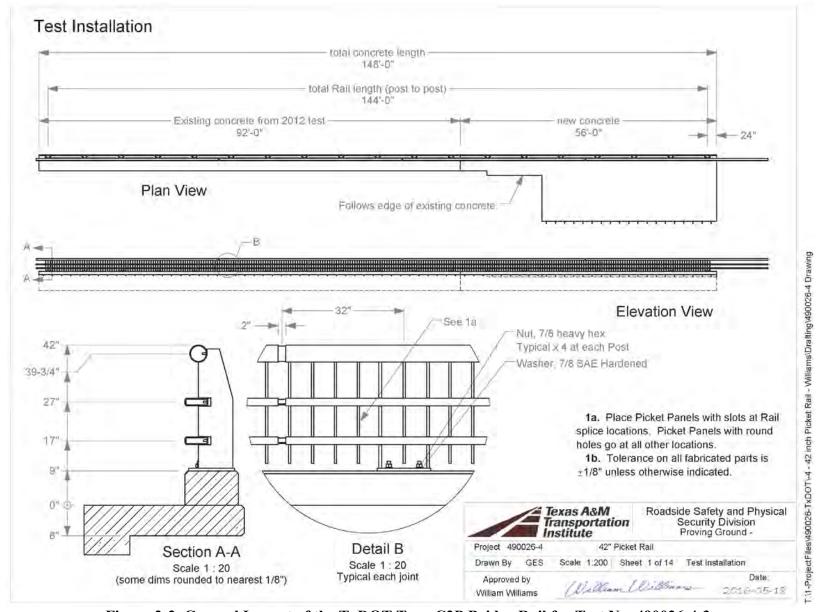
General Layout of the TxDOT Type C2P Bridge Rail for Test No. 490026-4-3.
